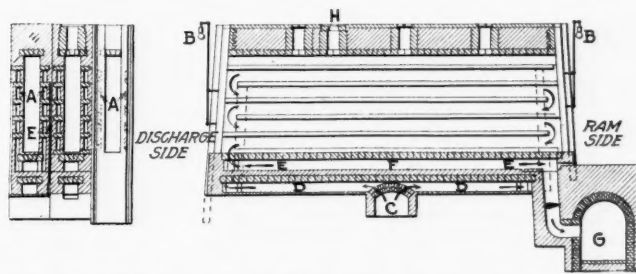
SECTIONAL ELEVATION OF LATEST TYPE OF SEMET-SOLVAY COKE OVEN
